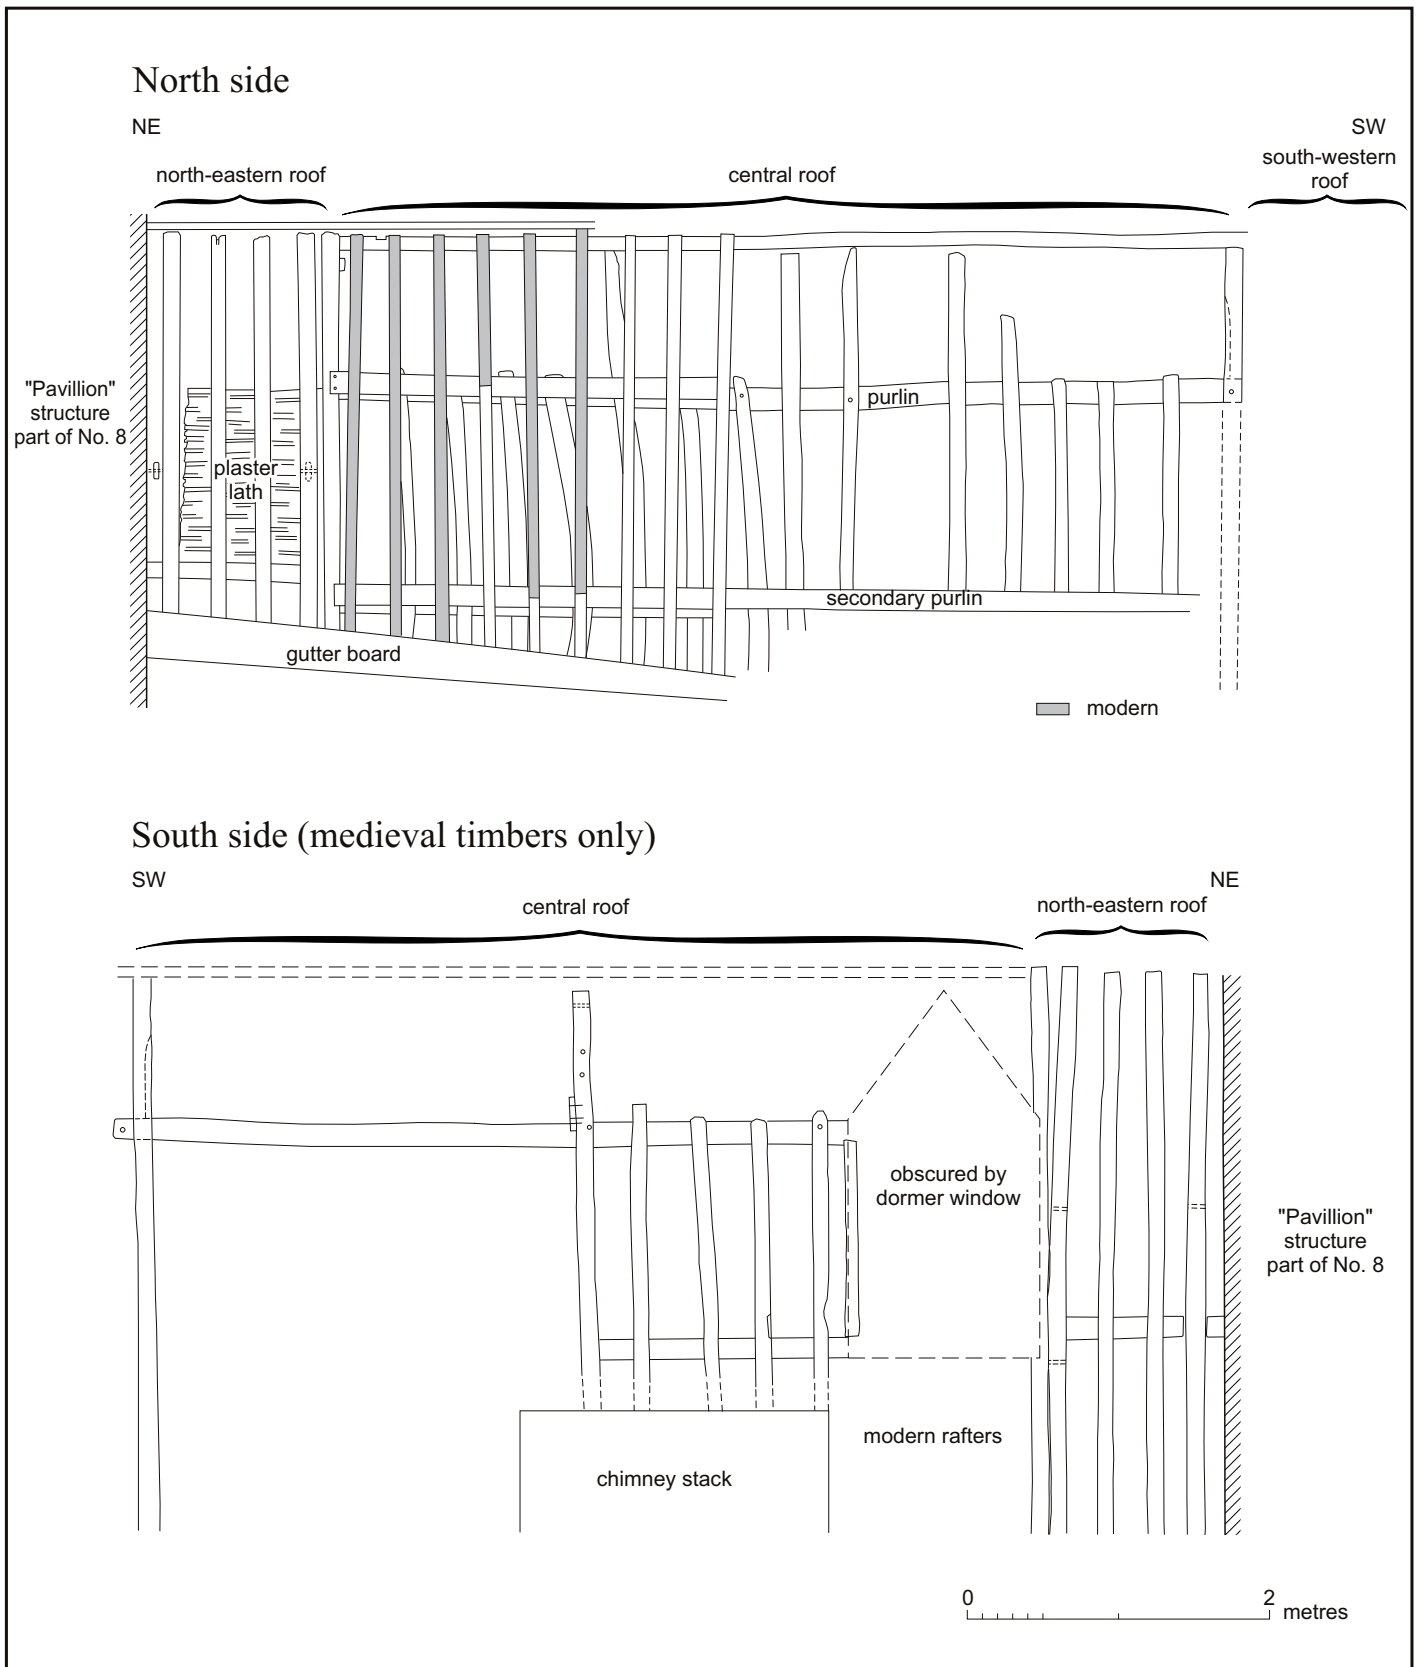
Plans of the rafters on the north-west and south-east sides of the roof of No. 9a showing the extent of the surviving timbers. Scale 1:50.
